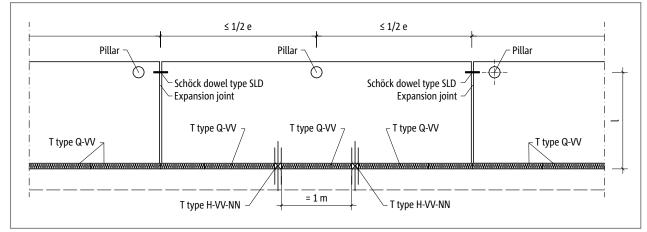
Schöck Isokorb® T type H: Expansion joint layout
